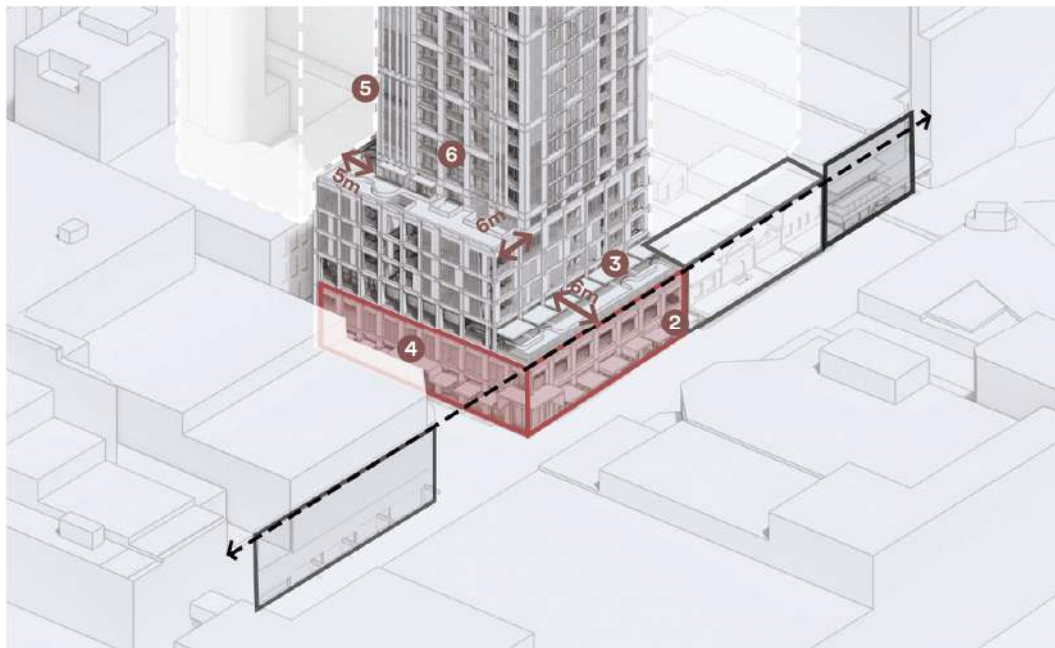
Proposal design envelope, treatment with adjacent street wall frontages indicated in black outline
